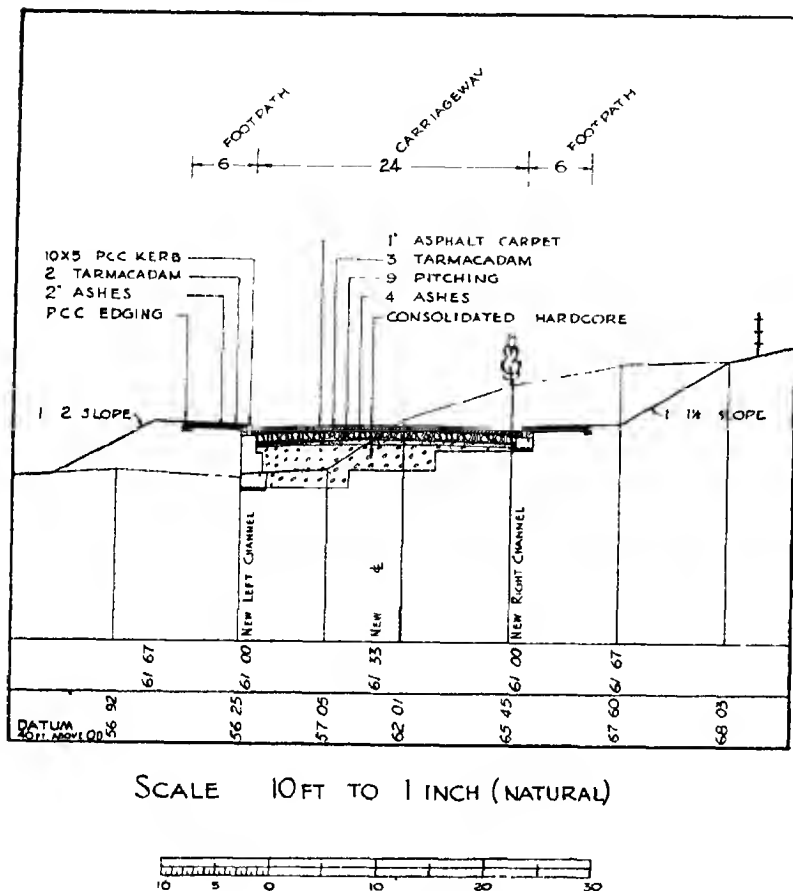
TYPICAL CROSS SECTION OF WIDENING.
